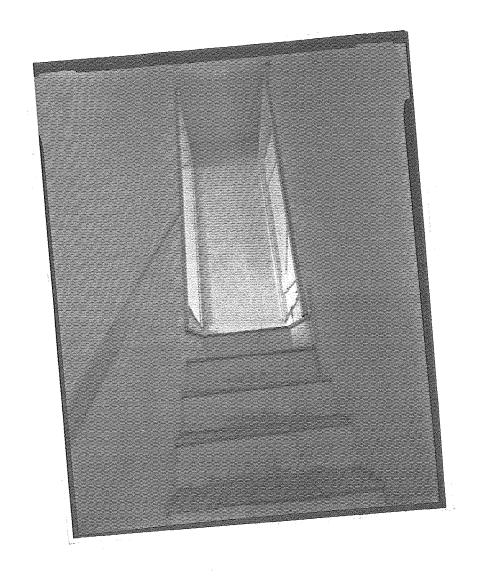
111-113 Ice Street, first floor: detail of the north staircase looking south.
